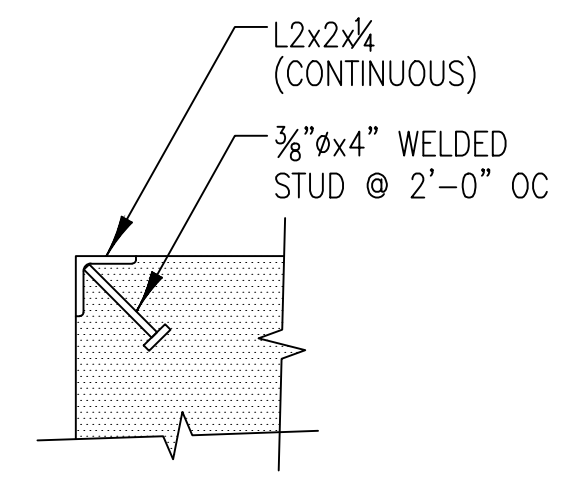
DETAIL - TYPICAL REINFORCING AT SLAB OPENING
